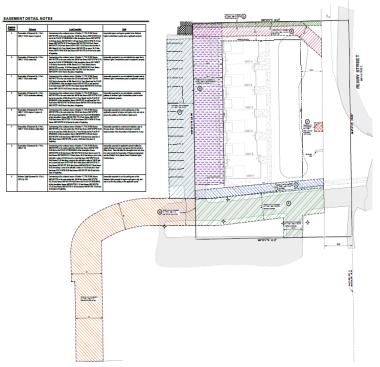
Color Coded Easement Exhibit (Sheet C-901 of the plan set)
